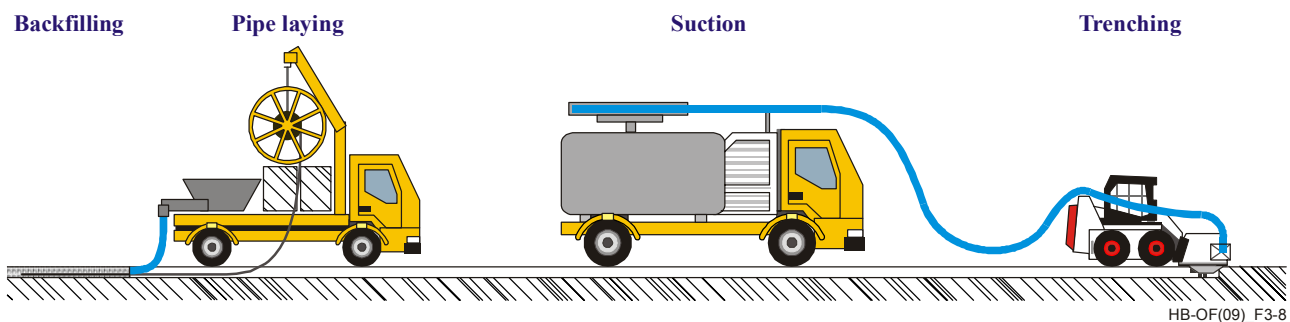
Schematic layout of enhanced mini-trench 5 × 30 cm technology
